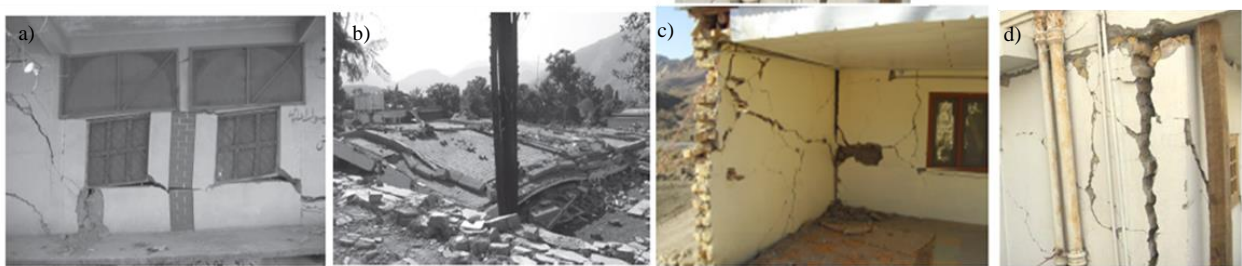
Typical damage patterns of URBM structures in Pakistan, a) shear cracks (Maqsood & Schwarz, 2008), b) heavy roof (Maqsood & Schwarz, 2008), c) collapse of walls and bond failure (Maqsood & Schwarz, 2010), and d) separation of orthogonal walls (Javed, 2009)
